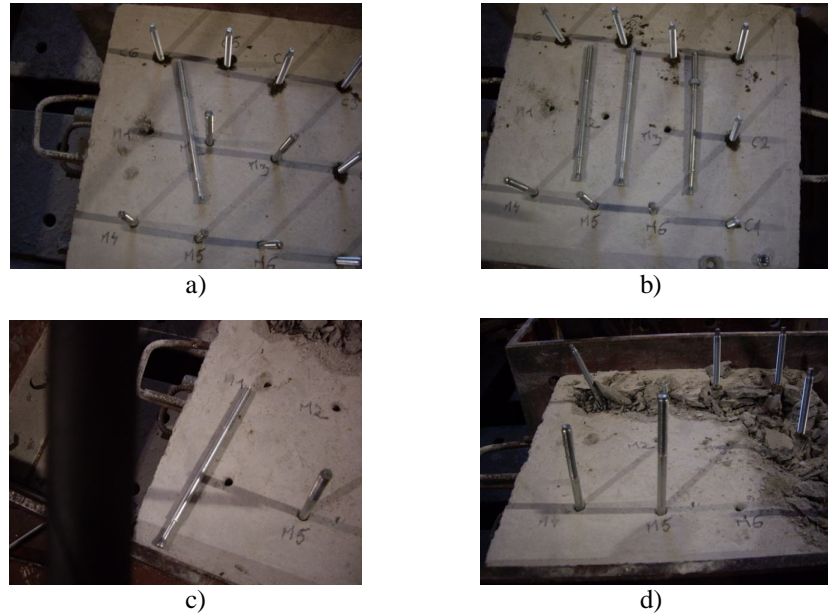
Failure mode of bolt anchors: a) M1; b) M2, M3; c) M4; d) M5, M6 in compressed reinforced concrete.
